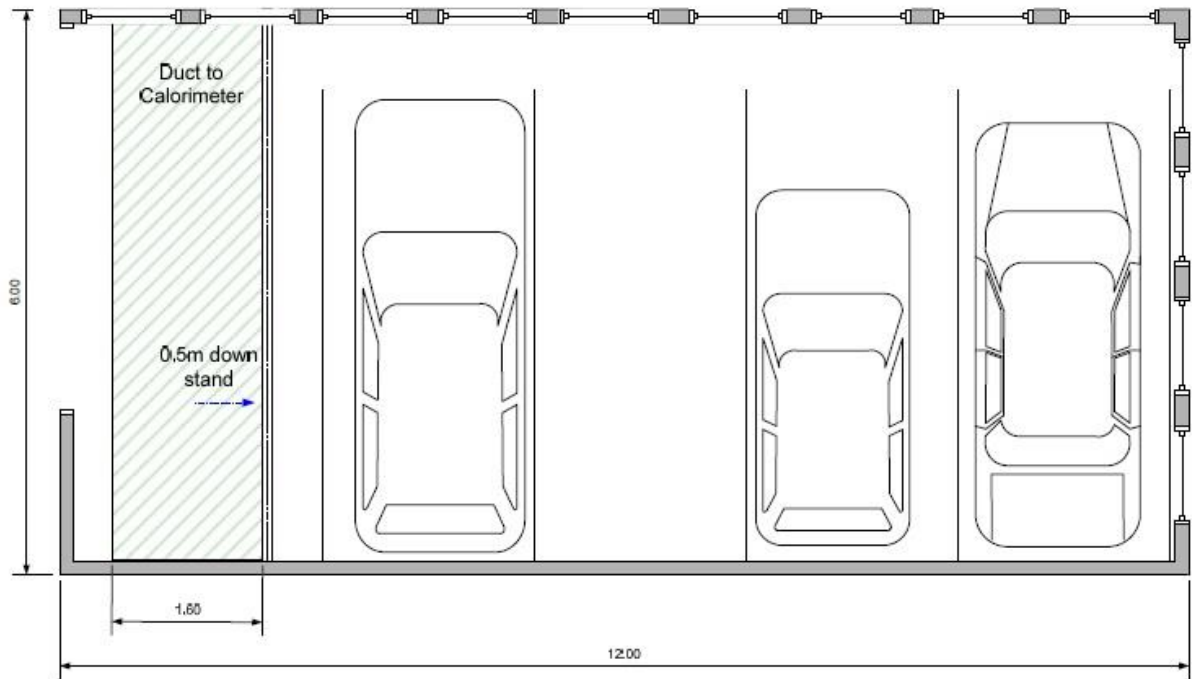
Plan of the experiment rig and vehicle arrangement for BRE Experiment 1 [1].
